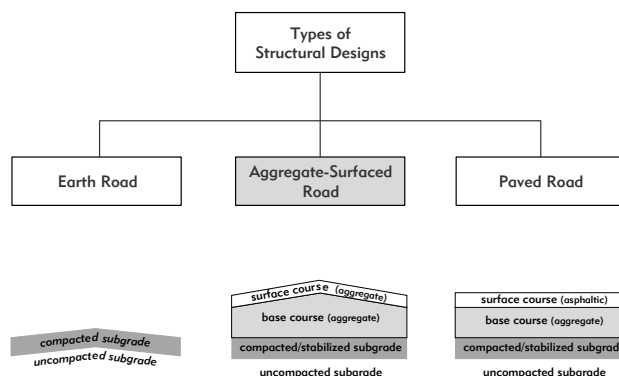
Typical types of pavement structures for forest roads in Central Europe
